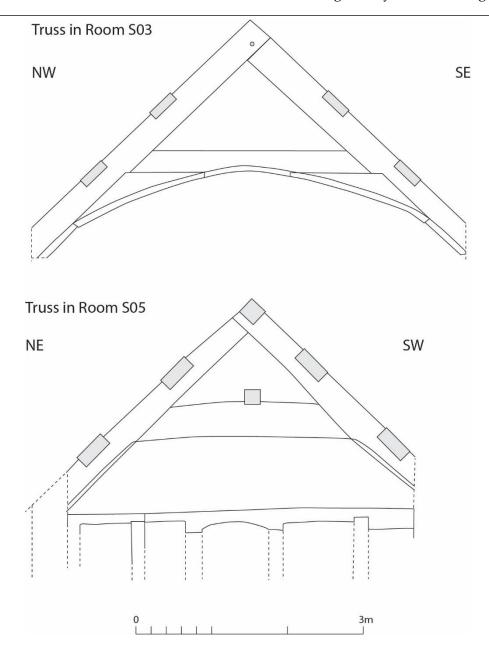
Roof trusses exposed in Rooms S03 and S05
